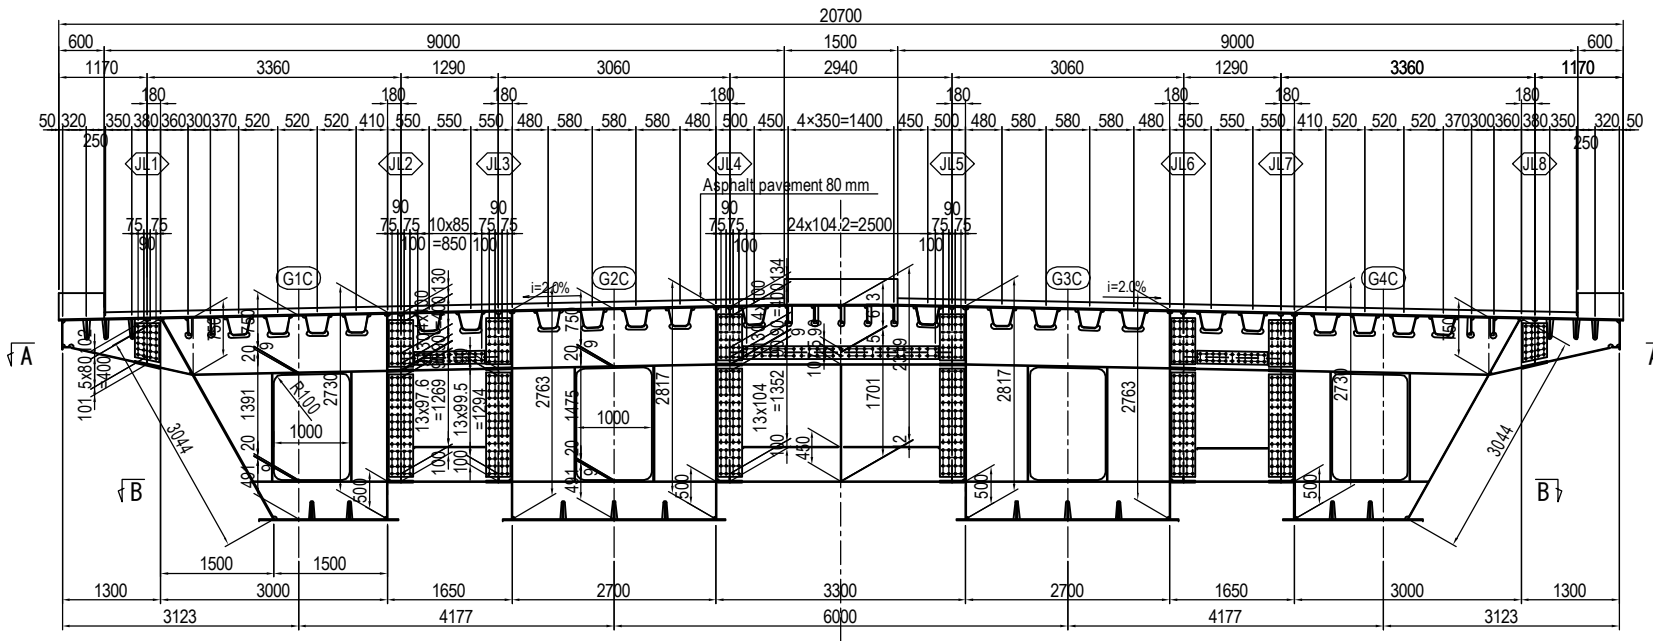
DETAIL OF CROSS GIRDER (5) (C5-C74) S=1:100
